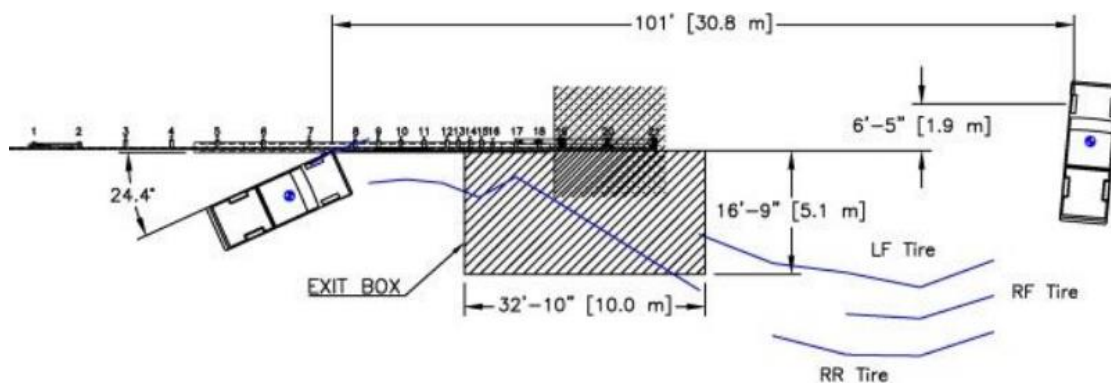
Test Impact Drawings for Test No. MWTC-3.
